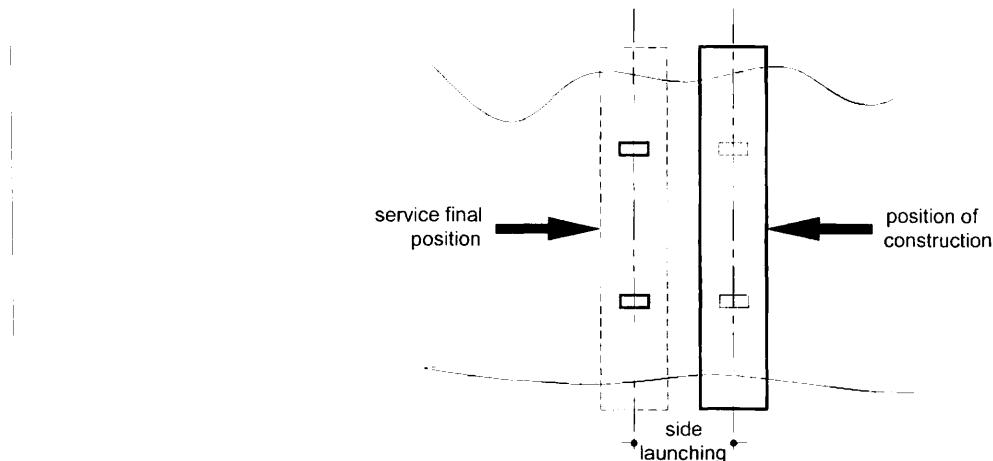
replacement of an old bridge or construction by lateral sliding
